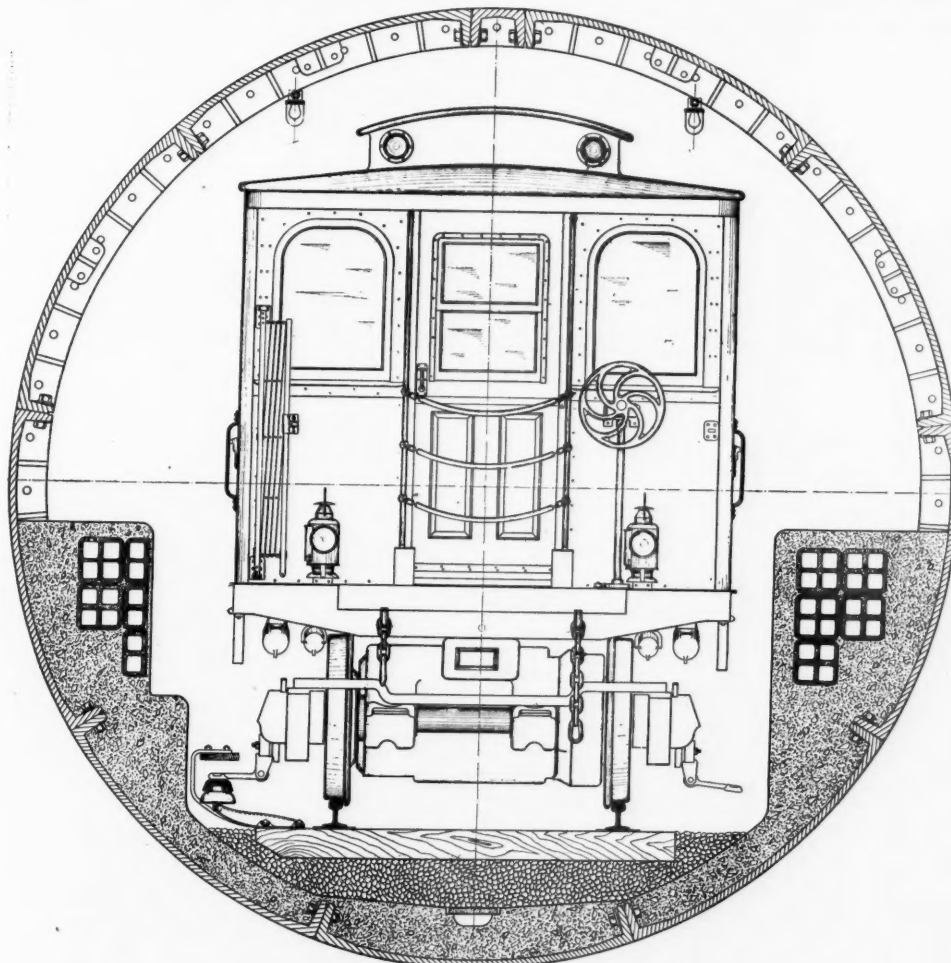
Cross Section of Tunnels Showing End Elevation of Steel Car; Hudson Companies.
